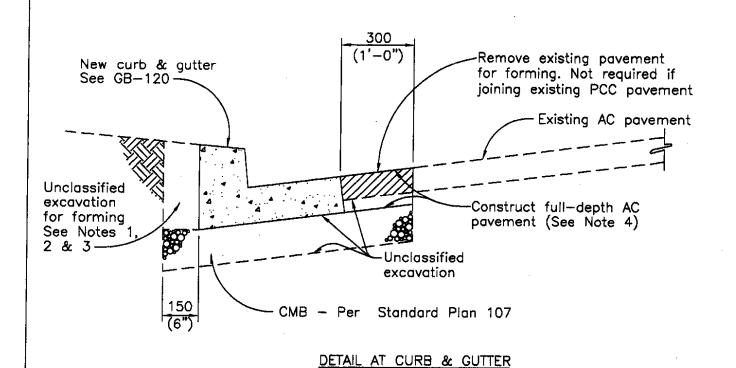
DETAIL AT PROJECT LIMITS AND SIDE STREETS
